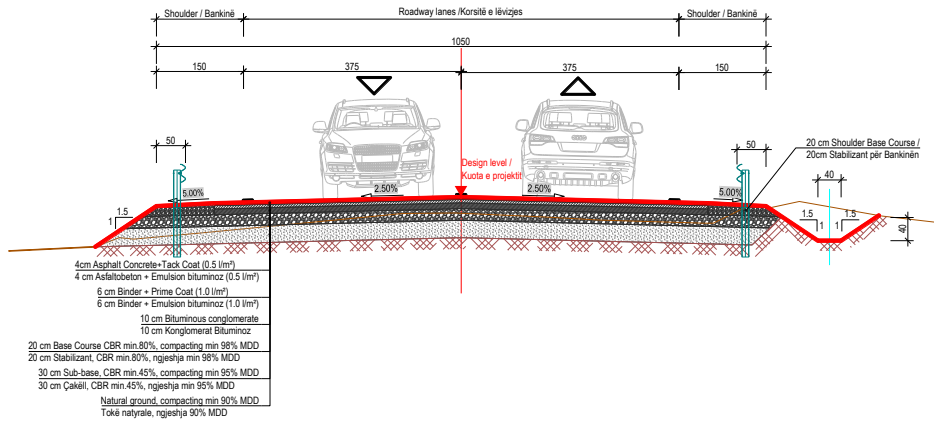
Typical Cross section No.1 - Interurban road "C1" (New National Road)
